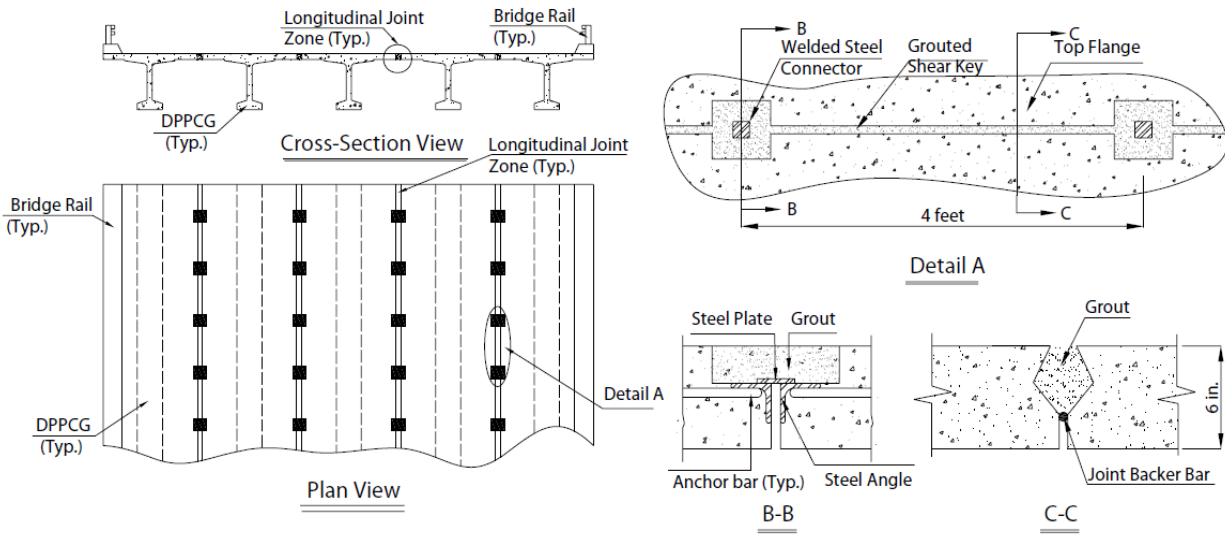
Former techniques in constructing the connection between decked bulb T beams using welded steel connectors (French et al. 2011)
